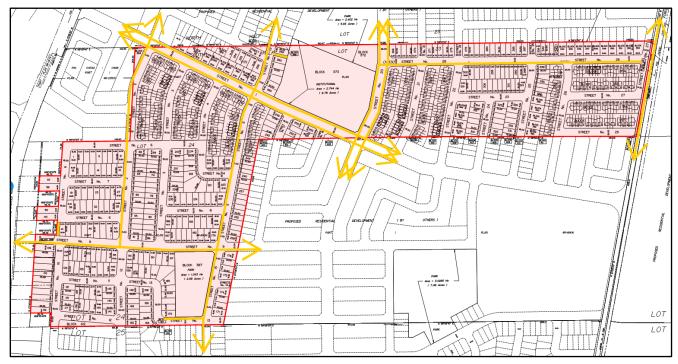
Sidewalks (yellow) will be provided on both sides of collector roads and on one side of some local streets to facilitate safe pedestrian movement.
